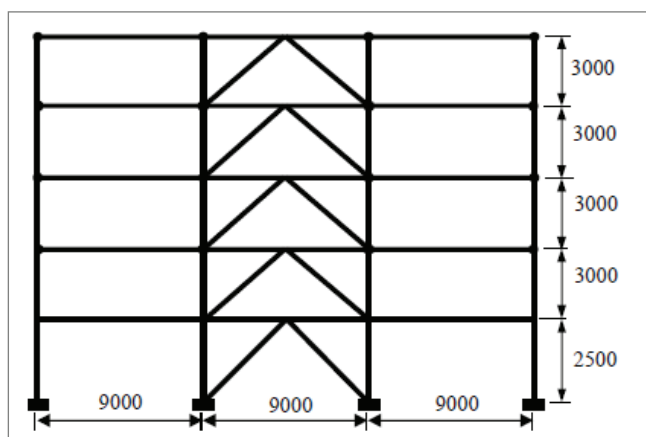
Long Span Steel-Concrete Composite CBF Frame
